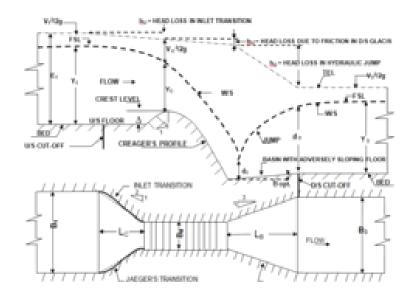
Plan and Section of Proposed Fall (See Appendix-1)
